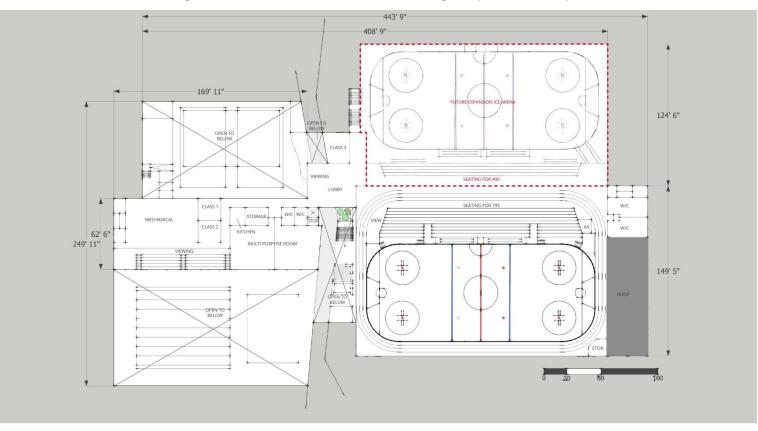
Wellness Centre Floor Plan Diagram (Second Floor)
